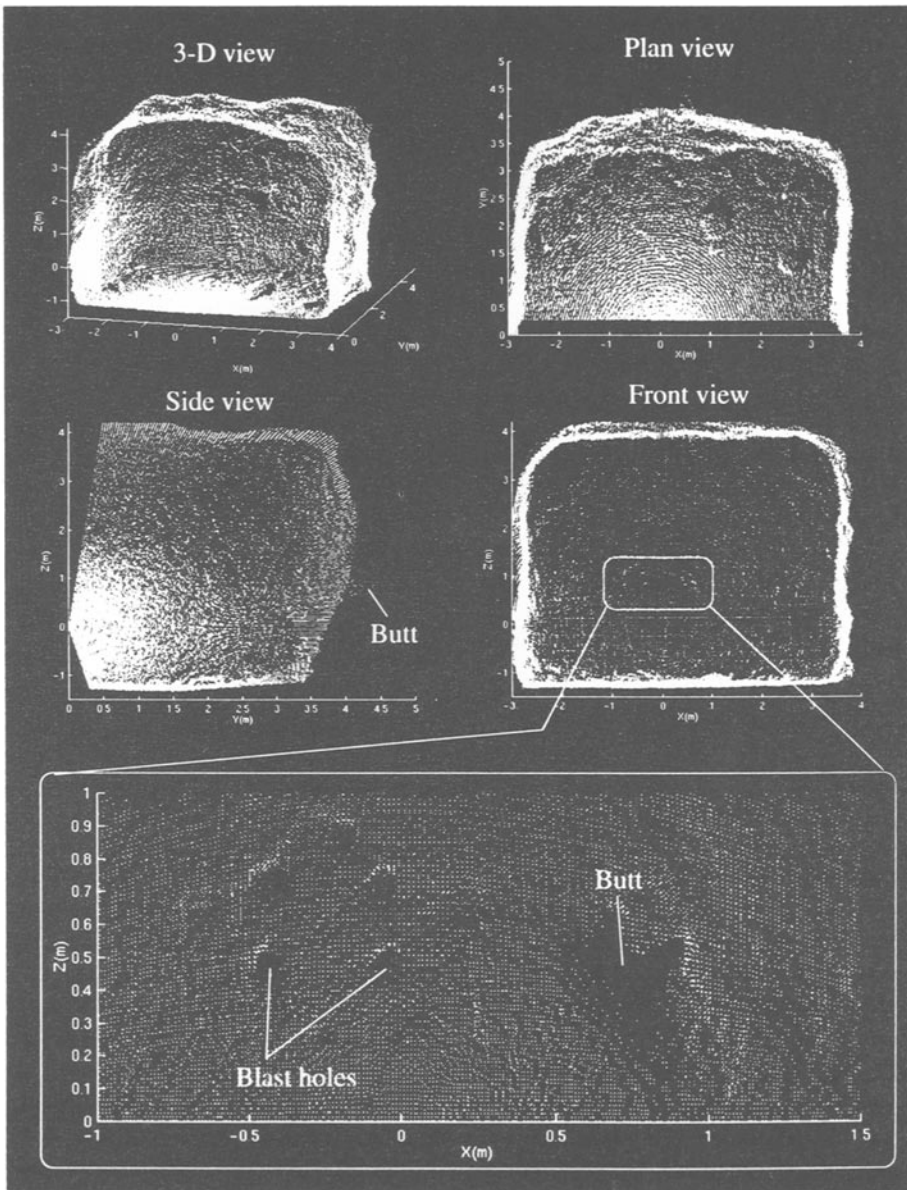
Results from the laser scanner looking at a charging face. Note the enlargement of the front view clearly shows a ring of drilled holes and a butt.
